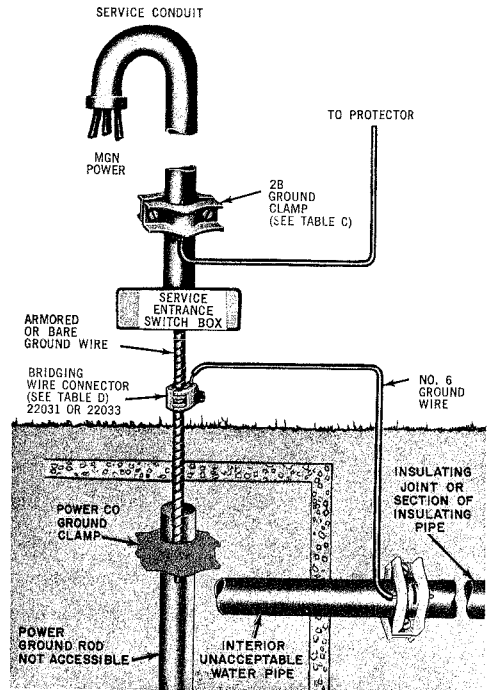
MGN Power Grounded to Inaccessible Ground Rod—Unacceptable Interior Water System
